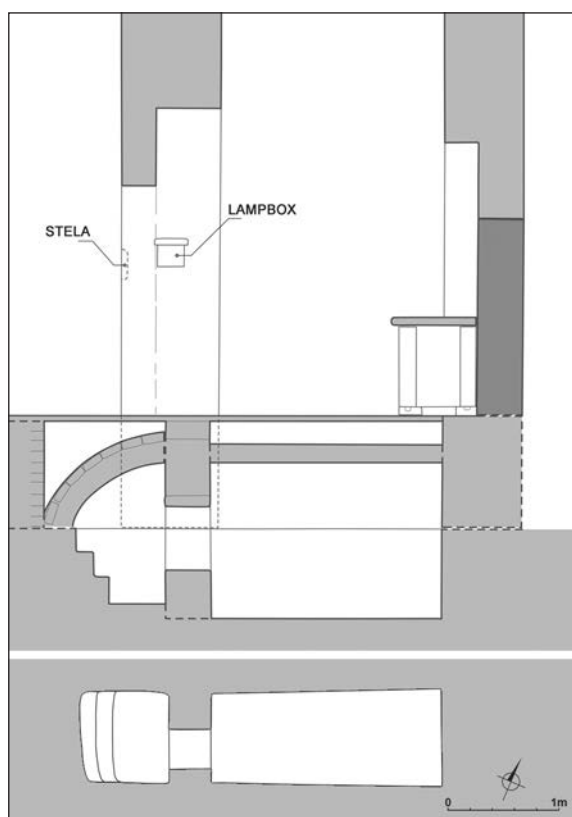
Sanctuary and crypt of Georgios: top, E-W section looking north with reconstructed altar; bottom, plan of crypt
